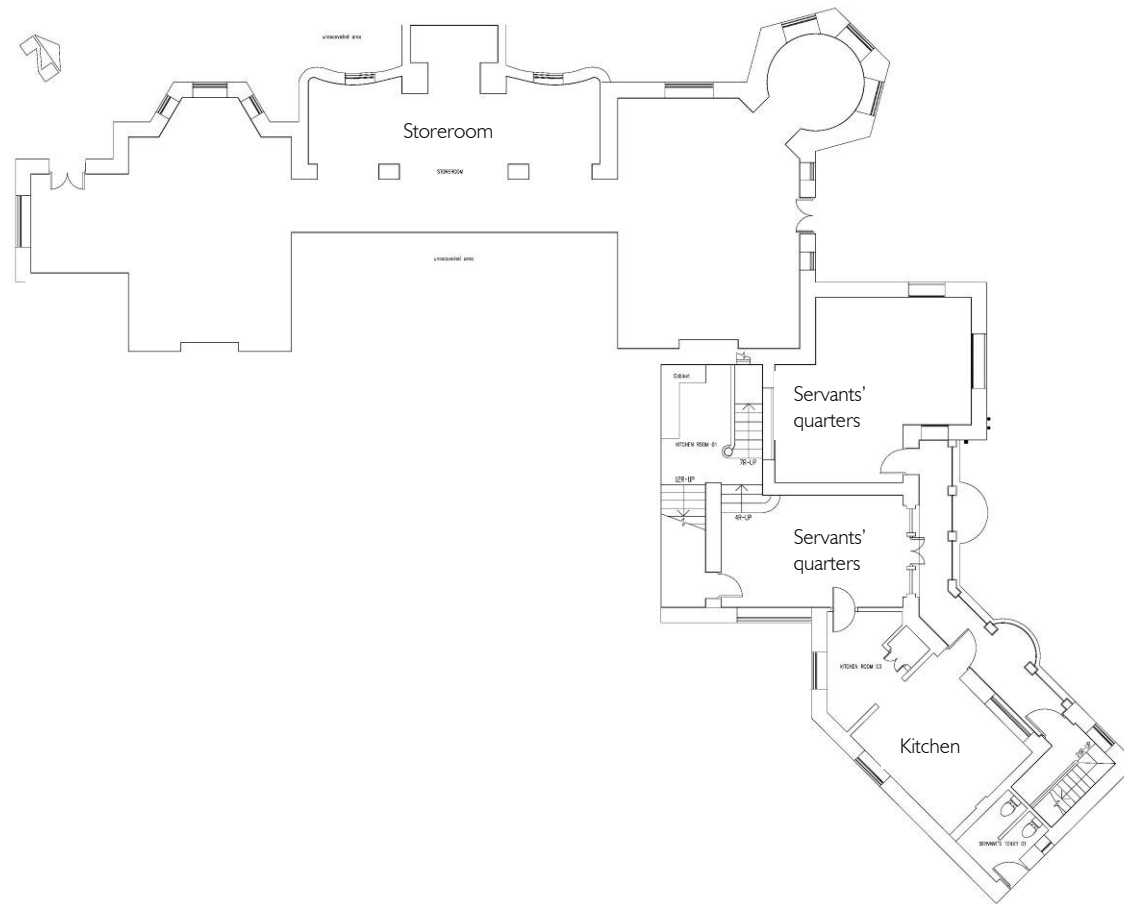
Existing Lower Ground Floor Plan (1:250).
